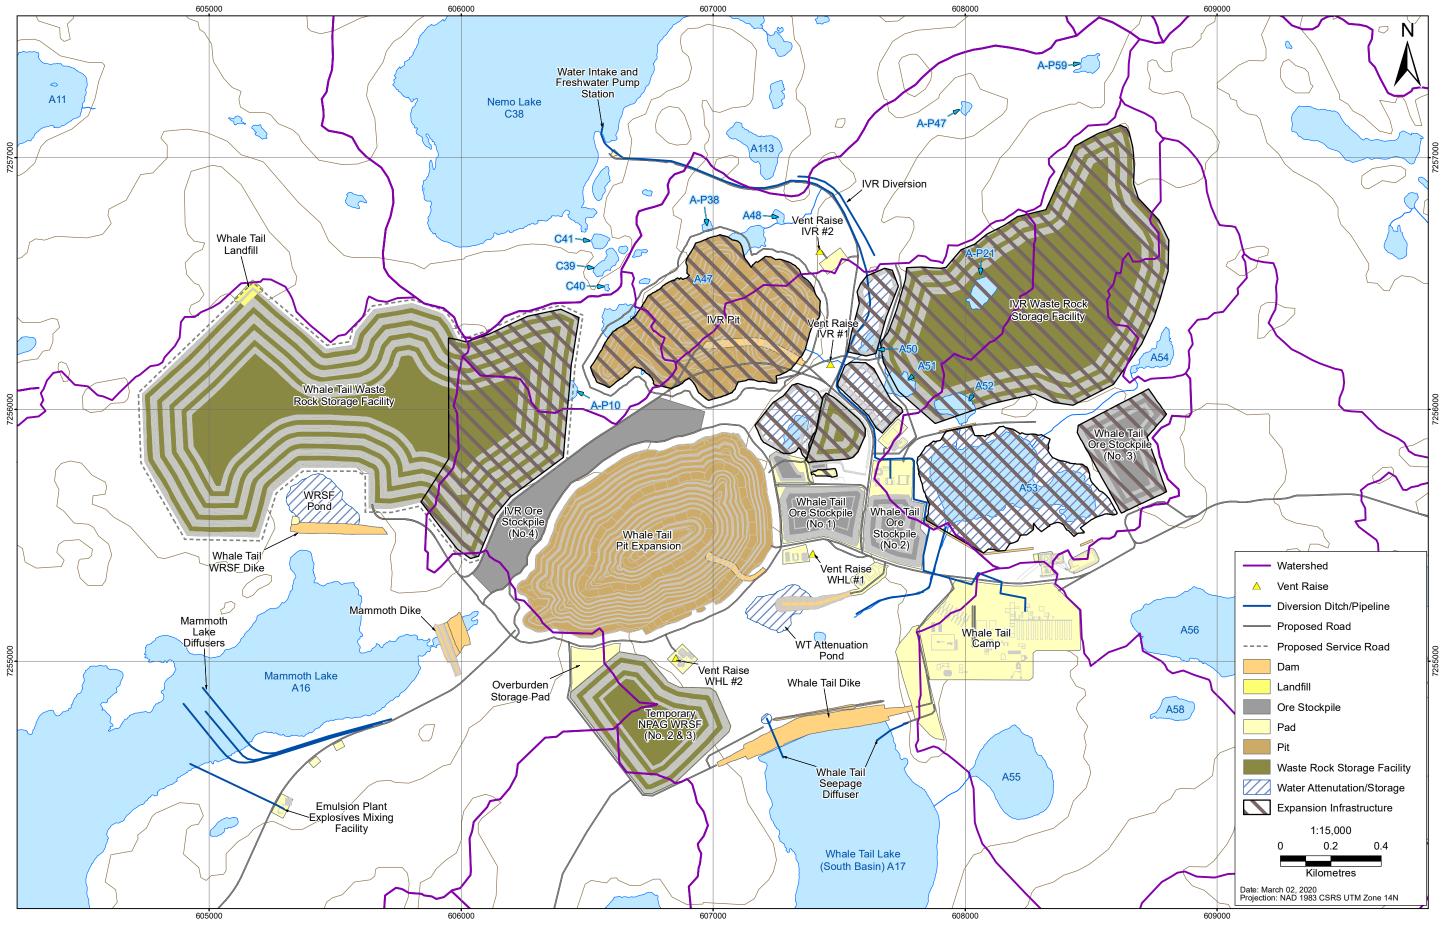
Whale Tail Pit Expansion Project – Approved Project and Expansion Project Infrastructure
